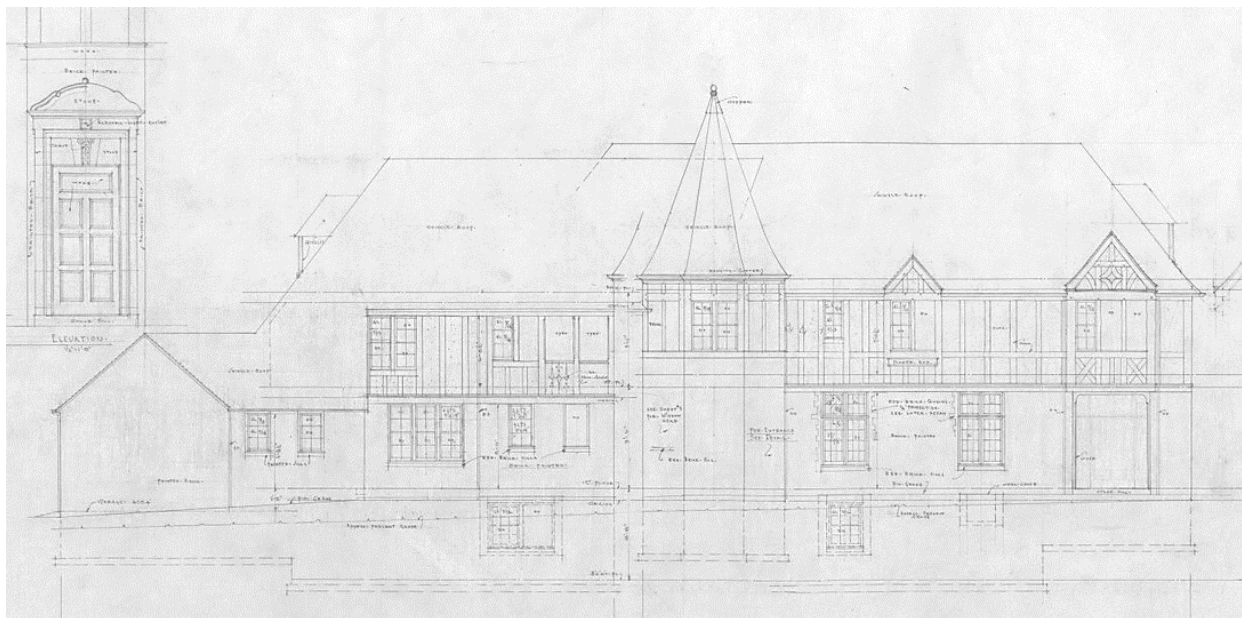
Alexander & Mira Printz Residence, 1620 Oakwood Drive (#10), Façade West Elevation
